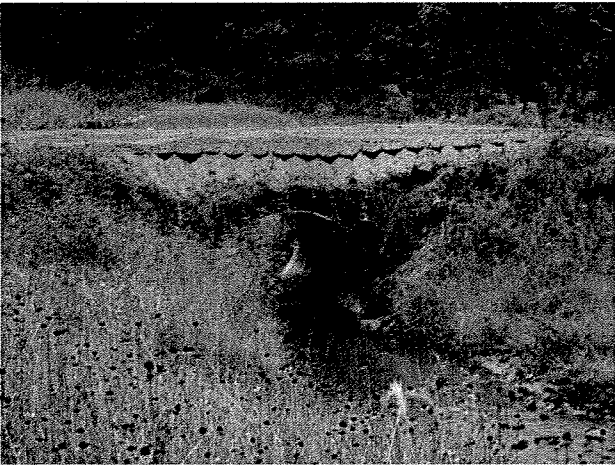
Looking downstream at root wad and log toe protection installed between LT Stations 10+10 and 10+30. (4/7/04)
